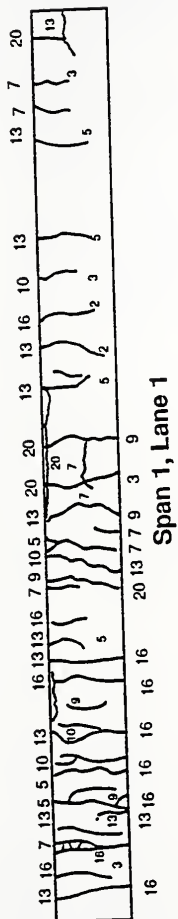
Crack Patterns, Bridge 40-49-7032
